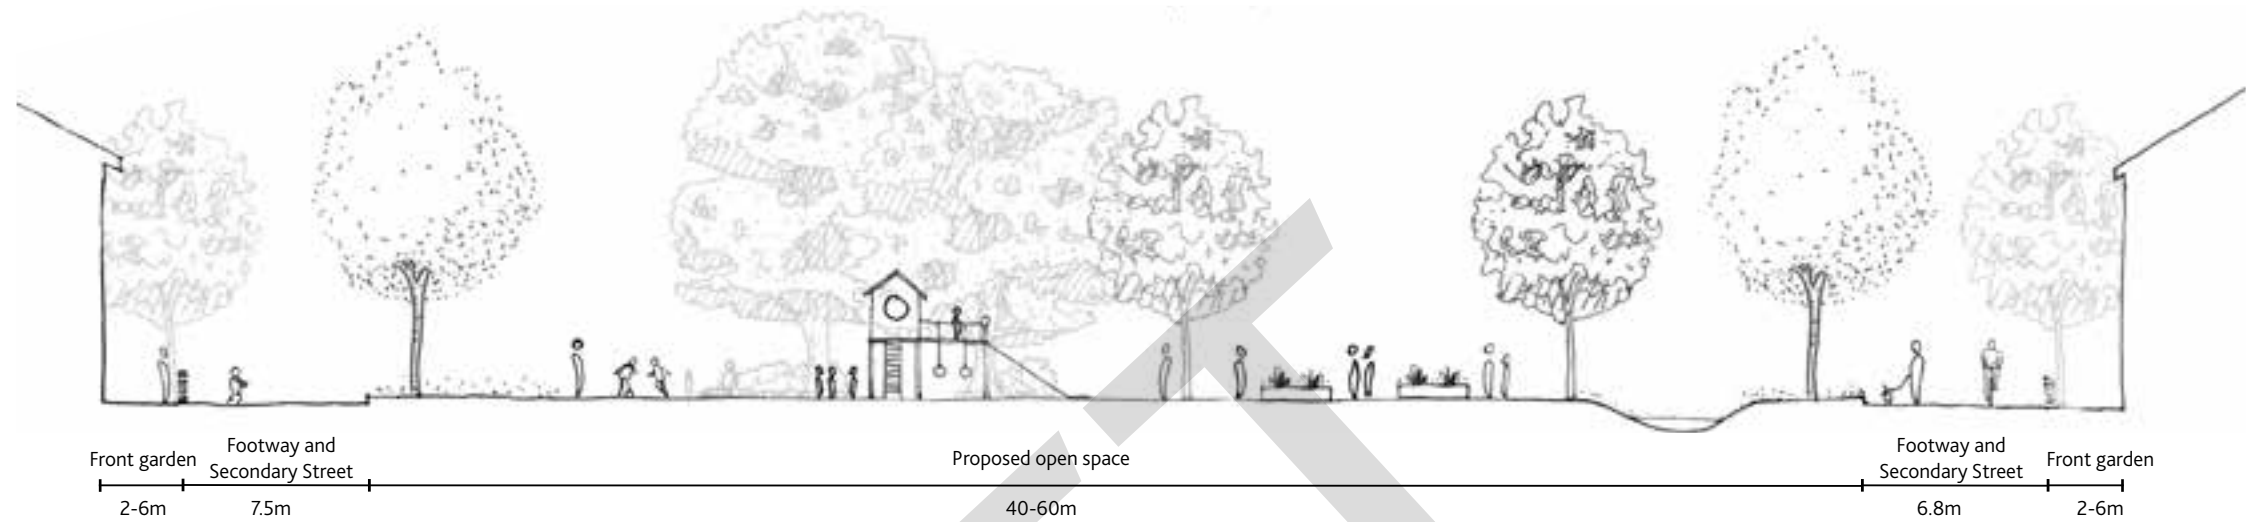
Typical street section 9 - Active Travel Route linking proposed open space
